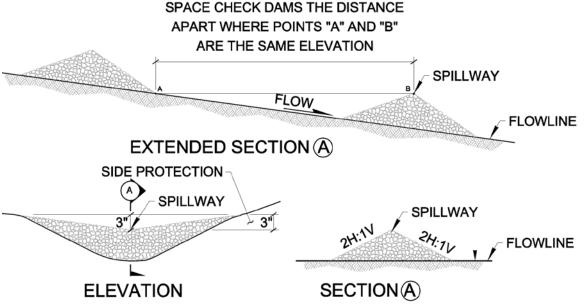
Check dam spacing depends on ponding depth and the facility's centerline slope, as shown in "Extended Section A" above. Adapted from City of Portland standard detail.
